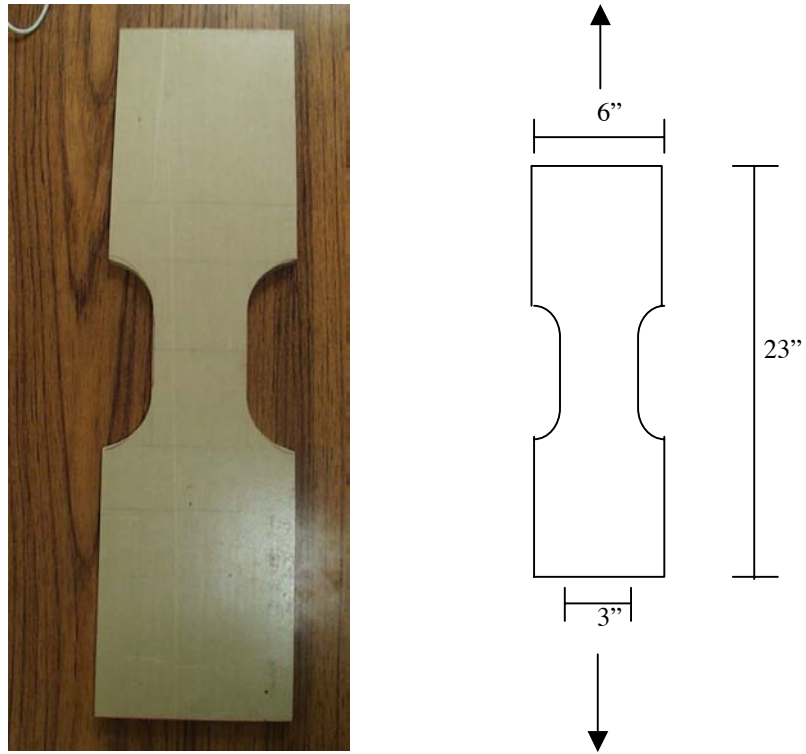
Tensile Test Specimen Cut From Glass Fiber Reinforced Vinyl Ester Beam
